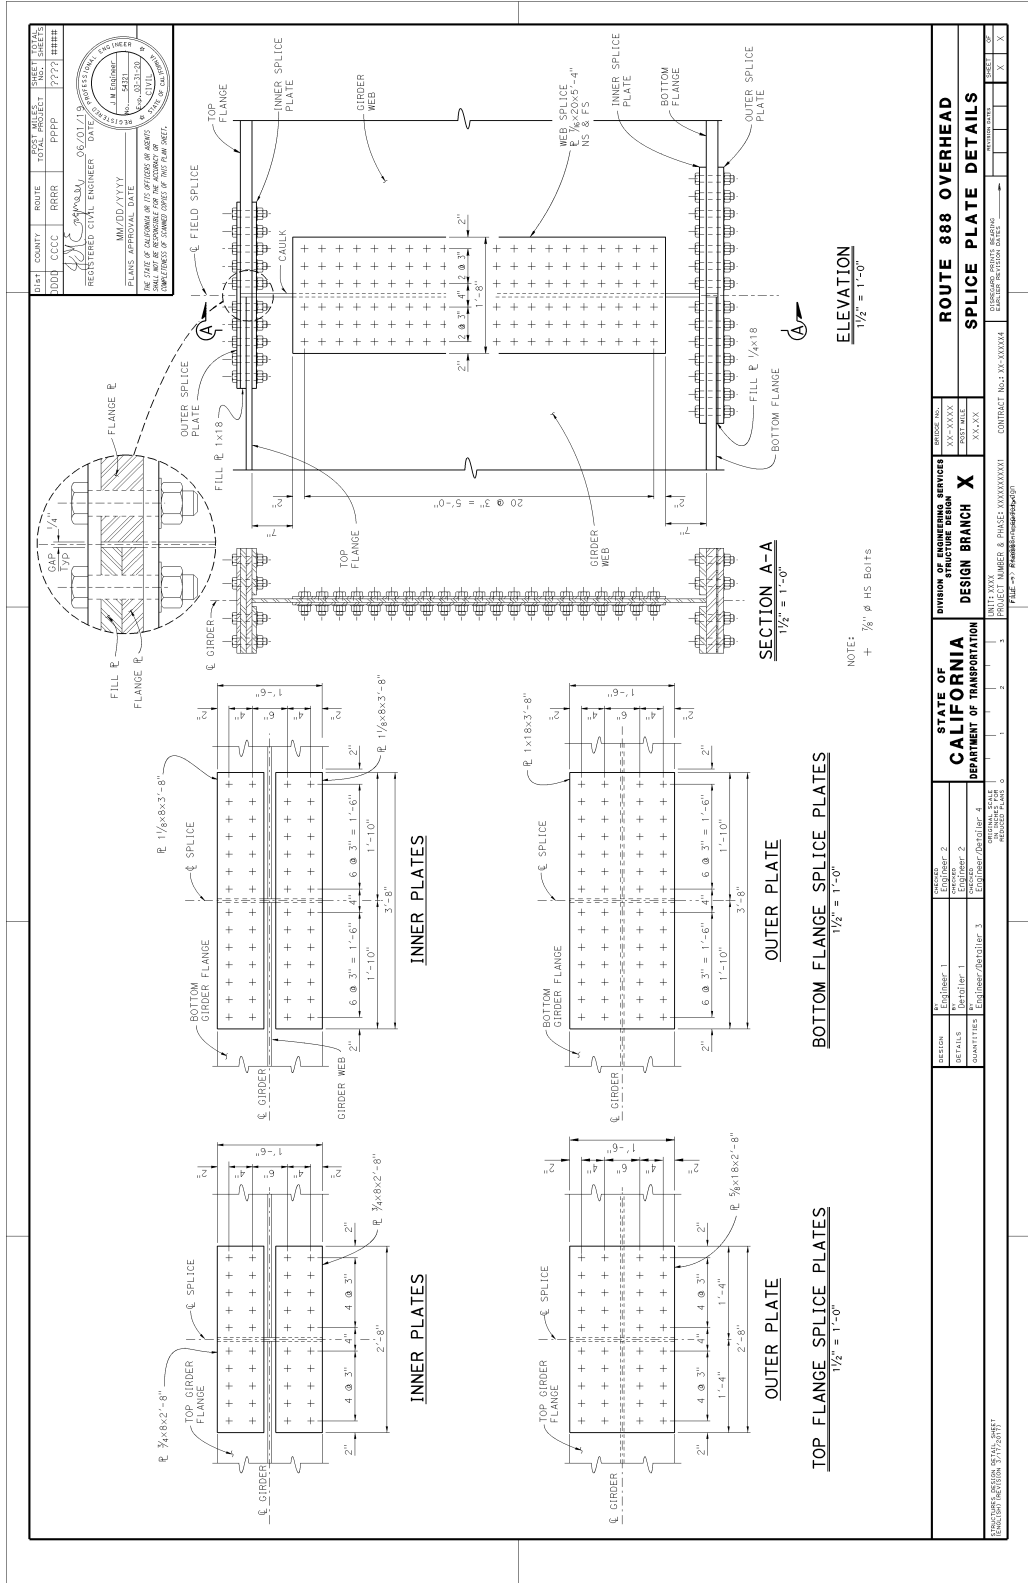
A.A.14 Steel Girder Bridge Detailing Example 14
